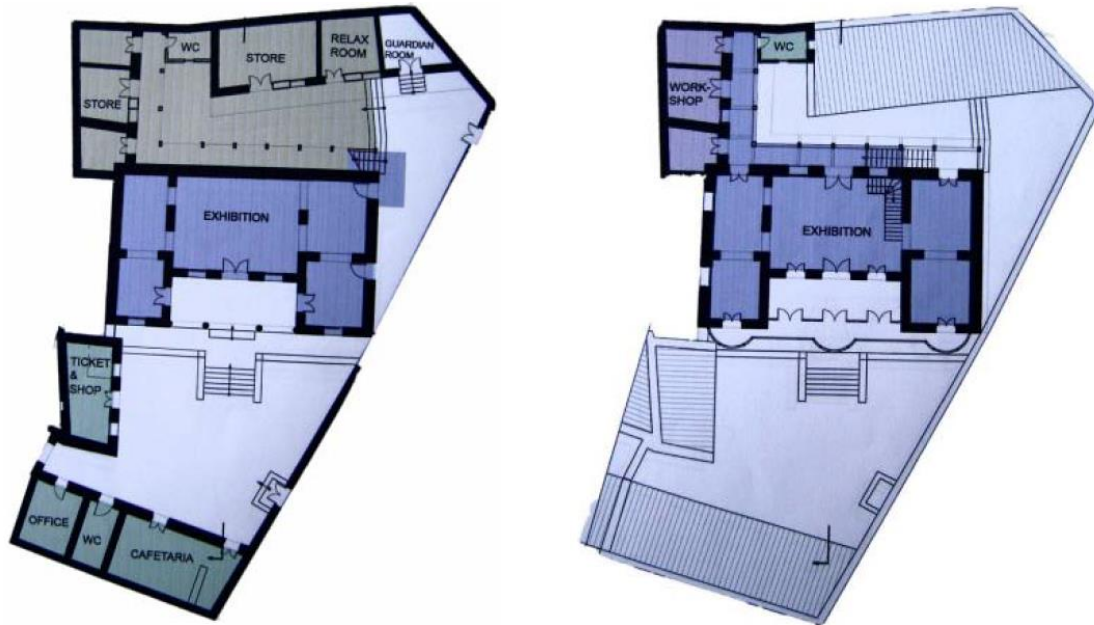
Proposed Ground floor and first floor plan for the exhibition
